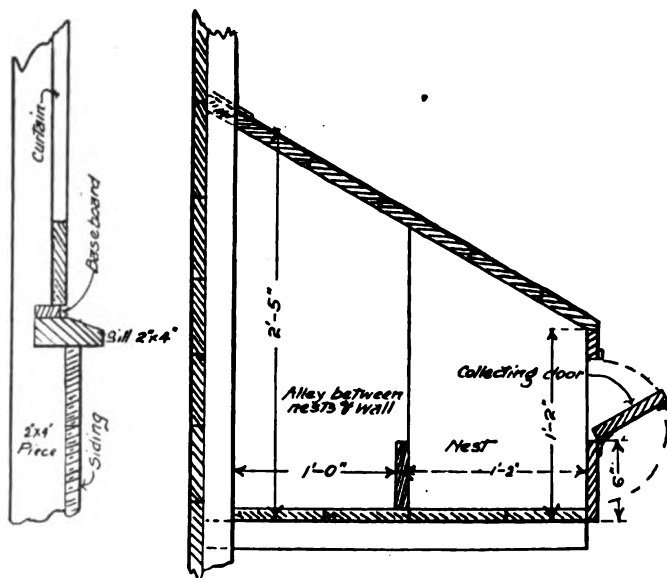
A detailed plan of the sill and baseboard construction for a cloth curtain, and a detail of nest construction for side-wall use
